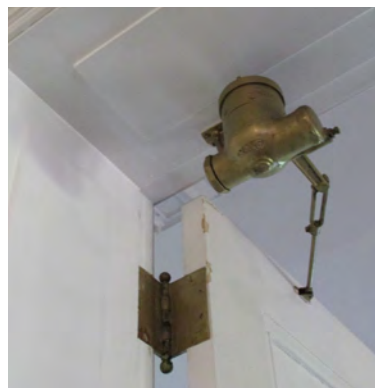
Door closer used at doors to Pantry from Stair Hall and Dining Room. (HA, 2015)
